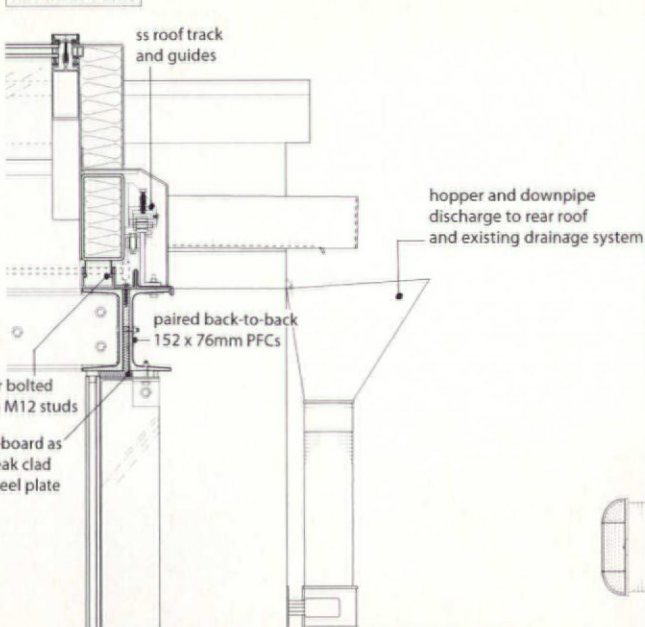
DETAIL CROSS-SECTION THROUGH RETRACTABLE GLAZED ROOF
